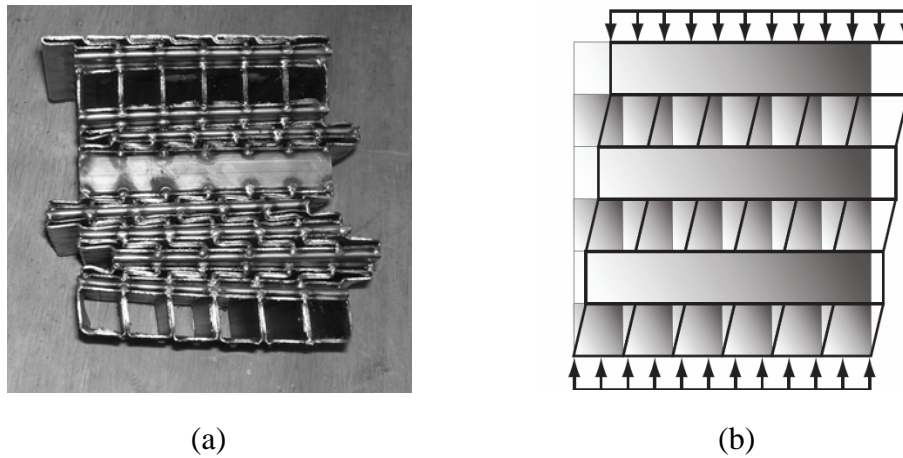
(a)- Post-test condition of the second-generation steel crush package and (b) failure mechanism
